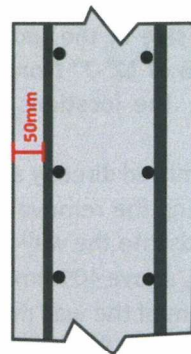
Conceptual View of Concrete Cover and Reinforcing Steel
